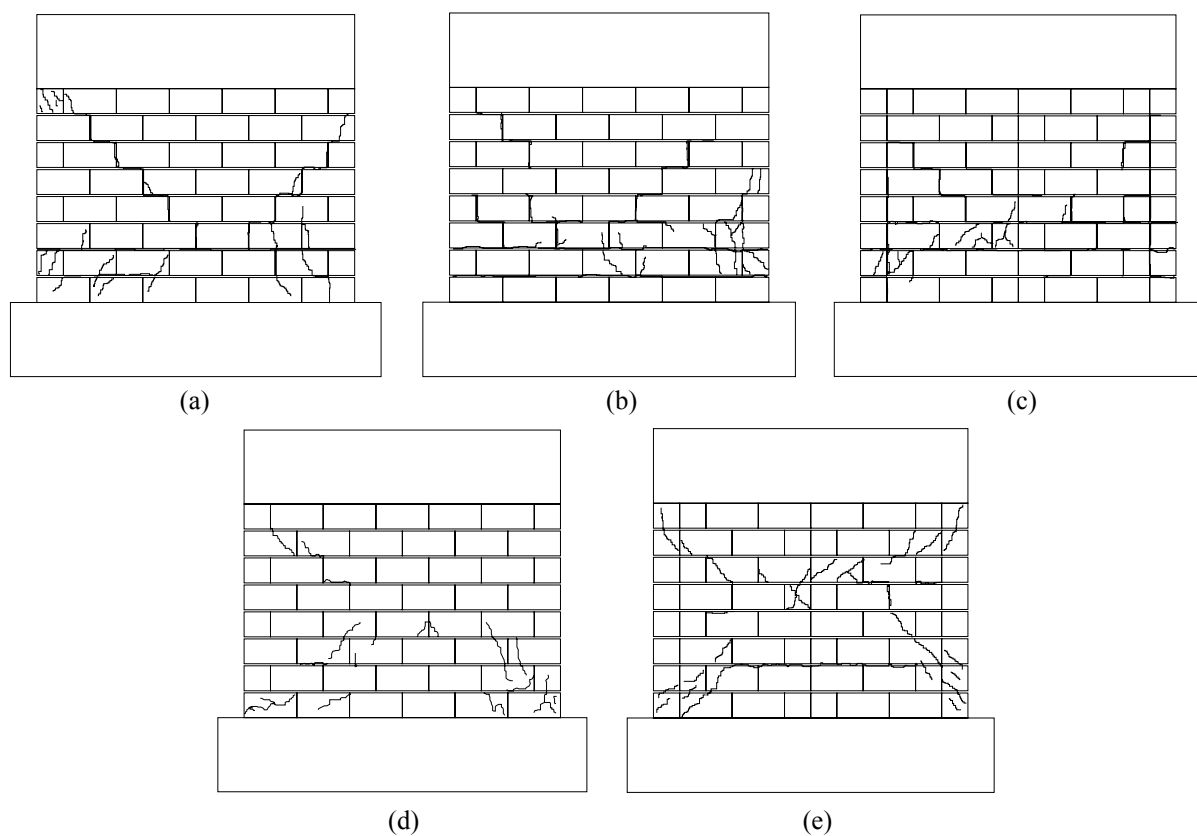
Failure modes for hollow concrete masonry walls with low vertical load: (a) unreinforced; (b) vertically reinforced inside masonry cells; (c) vertically reinforced in the joints; and with high vertical load: (d) vertically reinforced inside masonry cells; (e) vertically reinforced in the joints
